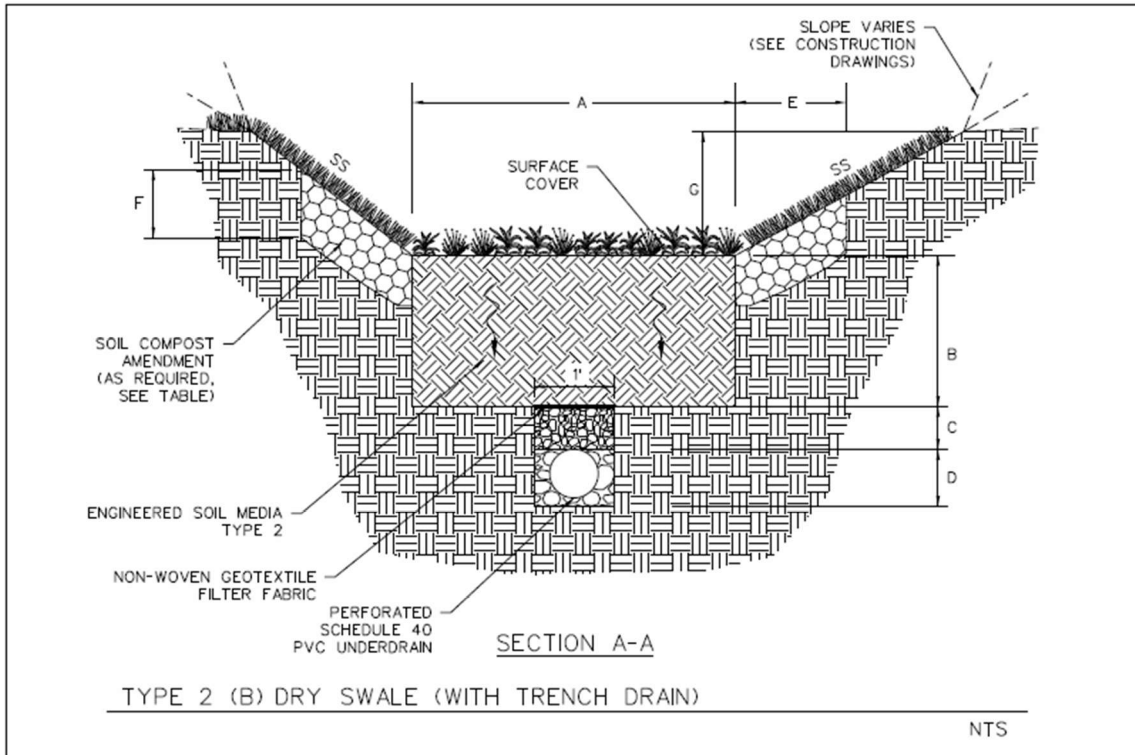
Typical Dry Swale – Level 1 [Cross-section View]
